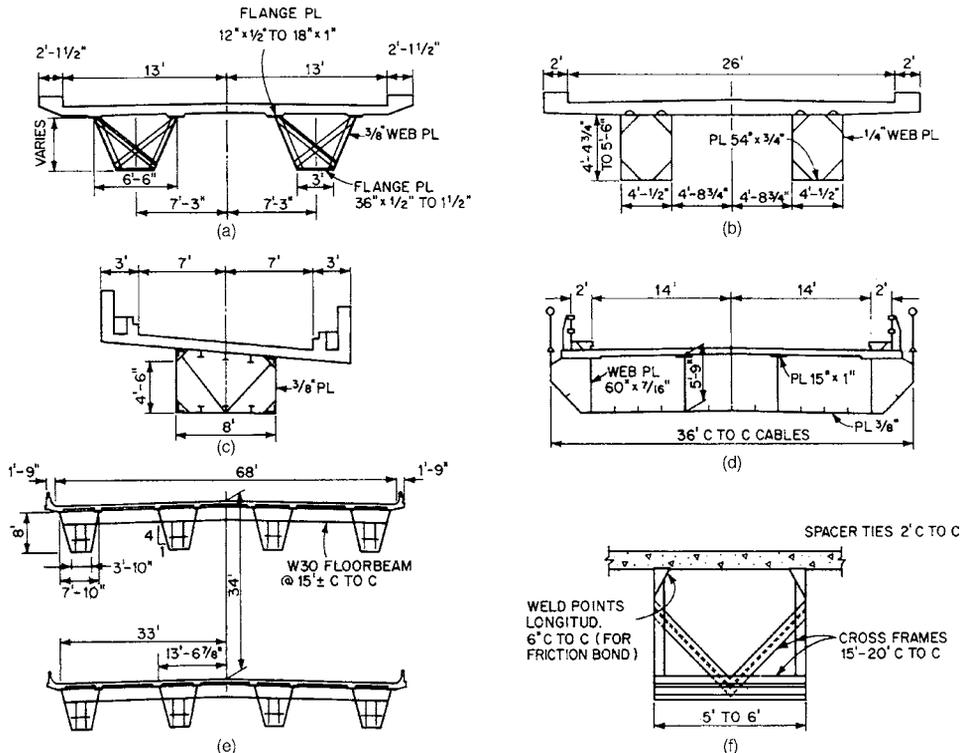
Examples of cross sections of composite box-girder highway bridges. (a) Rigid-frame construction with inclined legs, over Stillaguamish River. Spans are 50–160–85 ft and 200 ft c to c of leg pins. (b) Boxes with corners trussed for rigidity, in 110-ft span. King County, Wash. (c) Ramp with minimum horizontal radius of 67 ft and continuous spans of 58.5–52–73 ft, in Port Authority of New York and New Jersey Bus Terminal. (d) Suspension-box approach spans of 170–170 ft over Klamath River, Orleans, Calif. (e) Double-deck approach spans of 170–170 ft, Fremont Bridge, Portland, Ore. (f) Box UV girder proposed by Homer Hadley. V-shaped troughs formed by corner plates atop the webs are filled with concrete to secure composite action with concrete deck.
